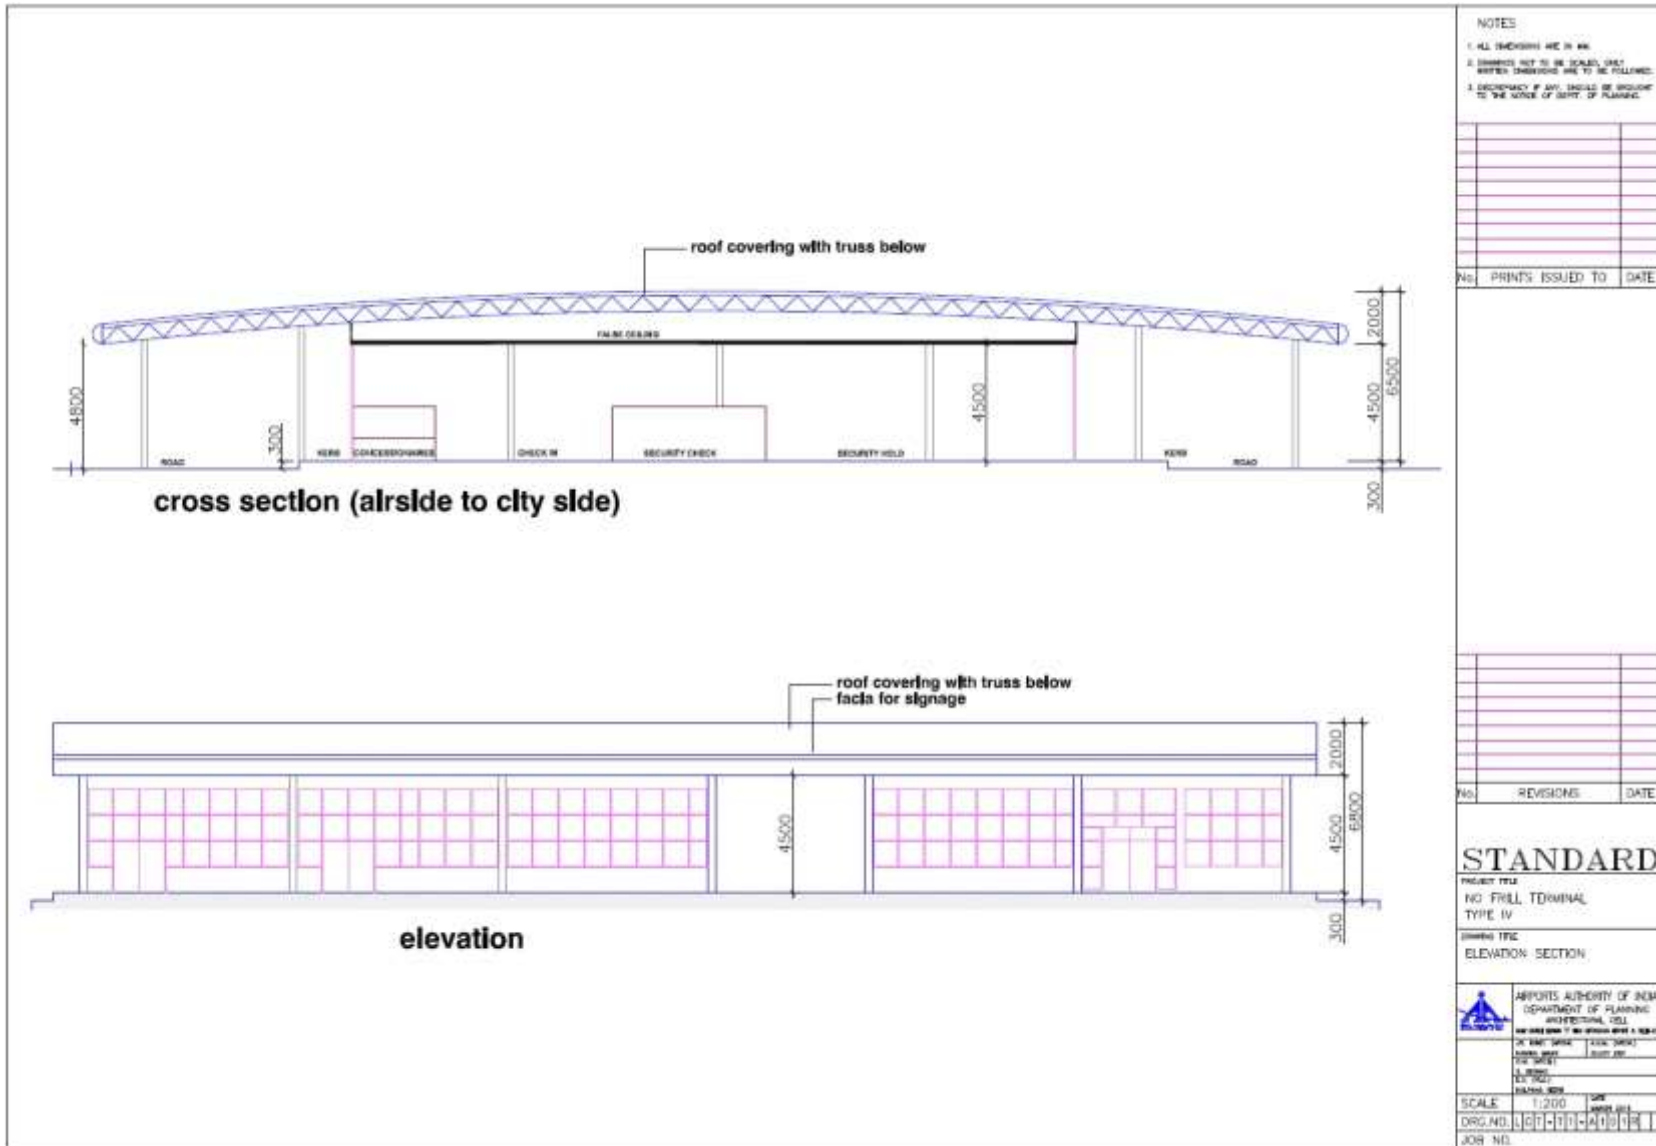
Elevation Section of Proposed Terminal Building at Dhalbhumgarh Airport
